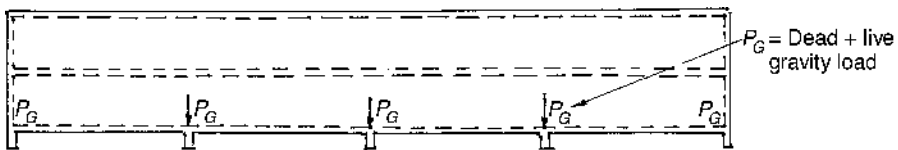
Side elevation showing incomplete cantilever design forces. Dynamic force caused by rocking motion can exceed P_G gravity load for which the building is normally designed.
